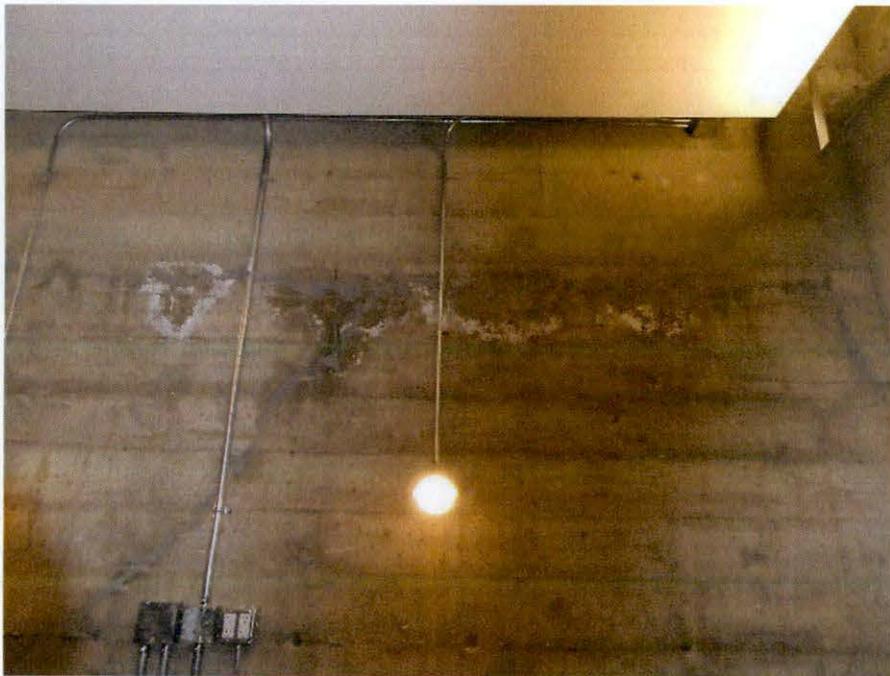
Example of efflorescence along crack in concrete wall - Ninth Floor.
